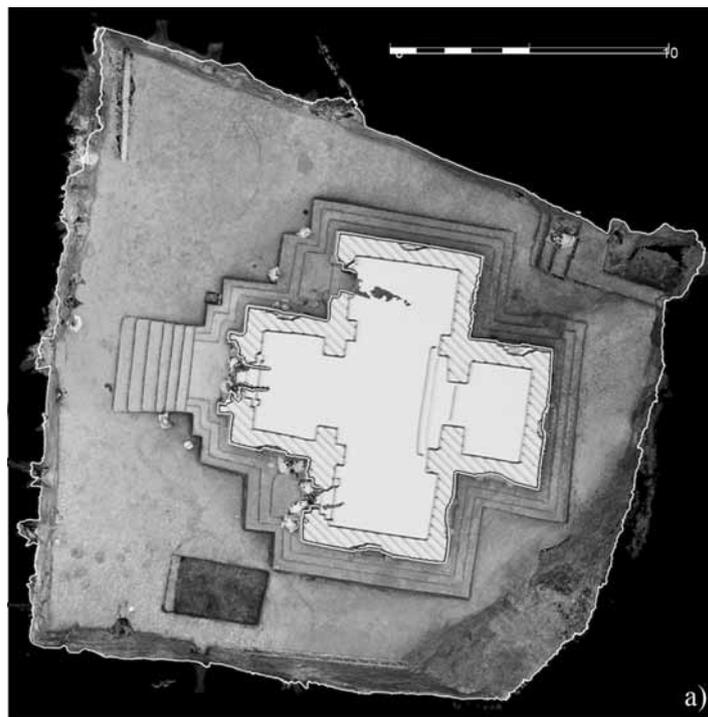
a Plan of Beta Giyorgis by Points cloud overlay whit a Bianchi Barrivera plan..
